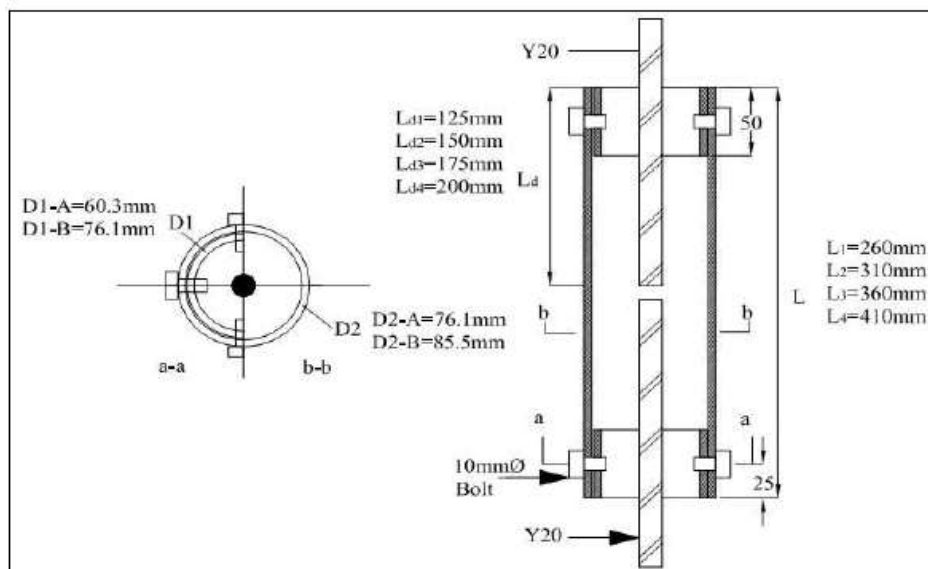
Detailing of grouted splice sleeve connector (Alias et al., 2014)
